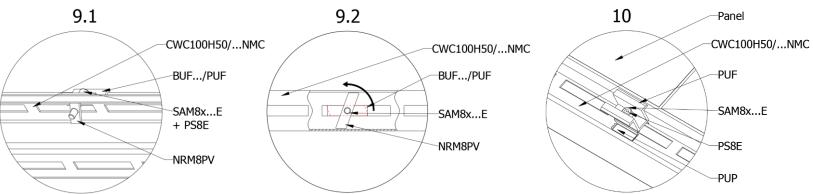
Detail of assembly of the clamps together with the earthing washer and locking of the channel nut
